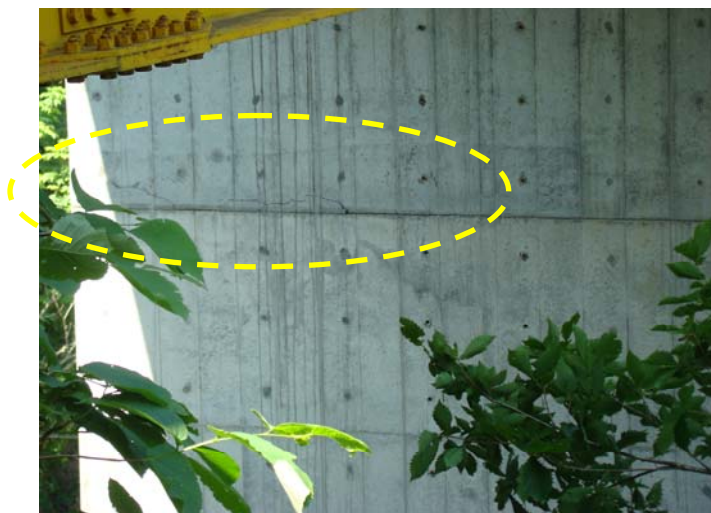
Crack at the Pier P1 (Around Joint of Concrete Placement)
